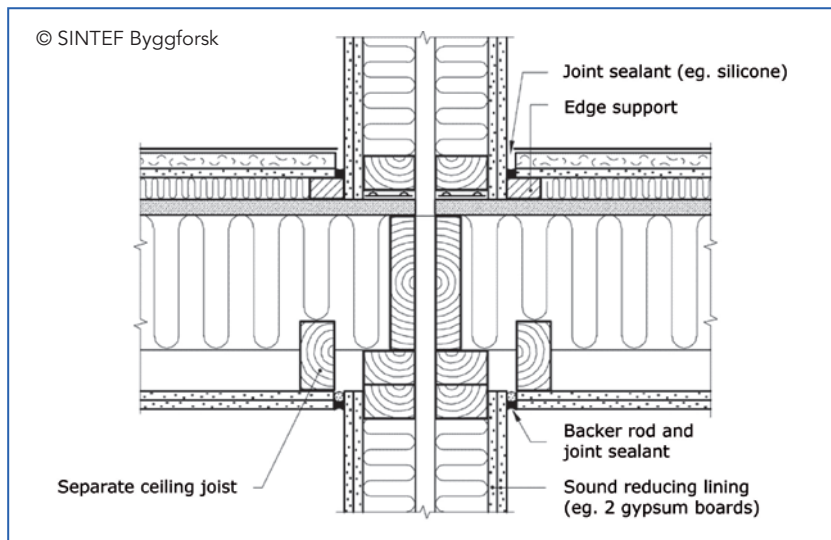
Generic detail showing typical separating wall and floor and the junction between them in terraced housing
